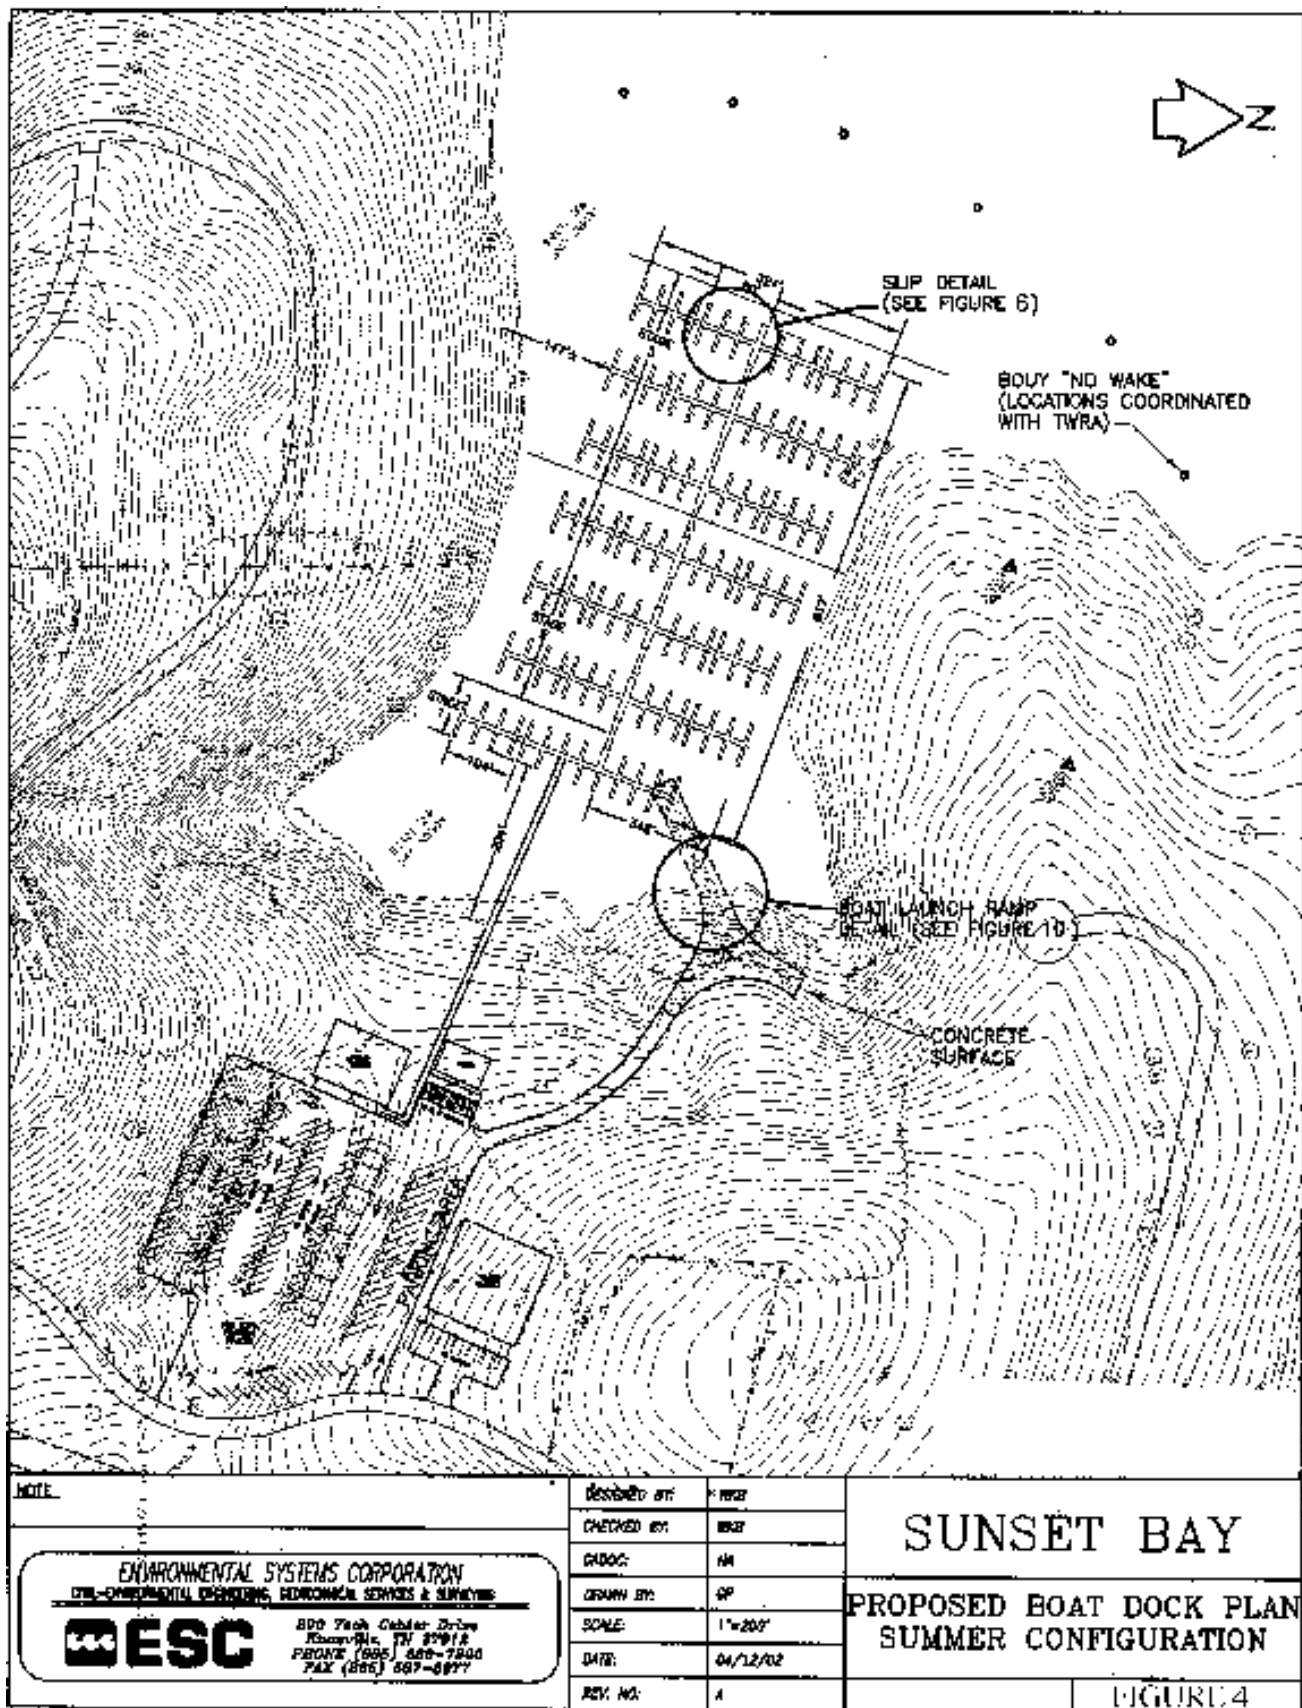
Sunset Bay Proposed Boat Dock Plan - Summer Configuration
